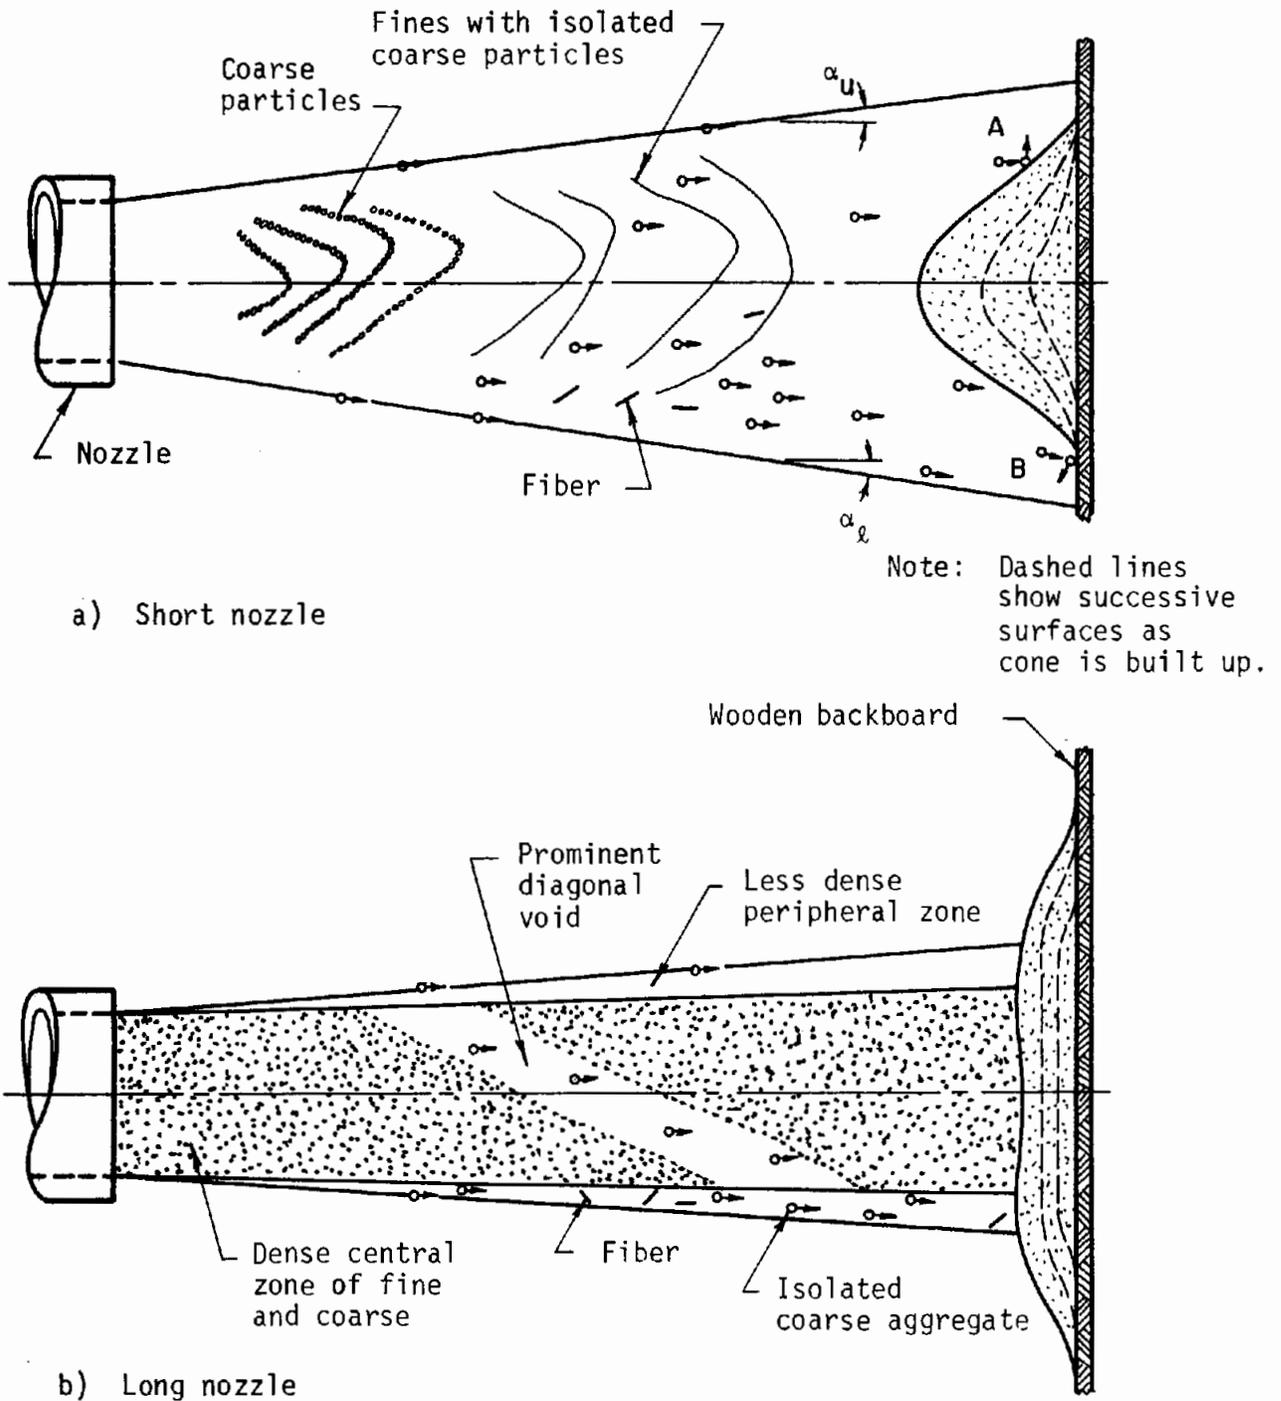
CROSS SECTIONS OF TYPICAL AIRSTREAM AND SHOTCRETE ON WALL
